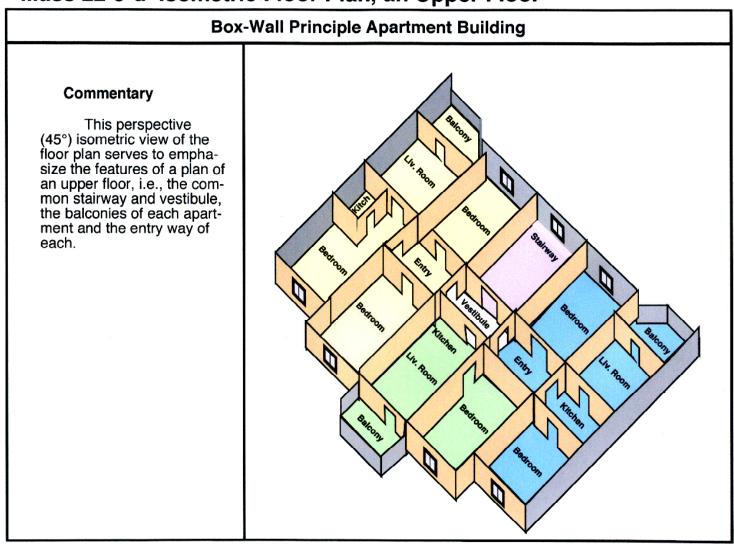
Mass 22-3-d isometric floor plan, an upper floor.
